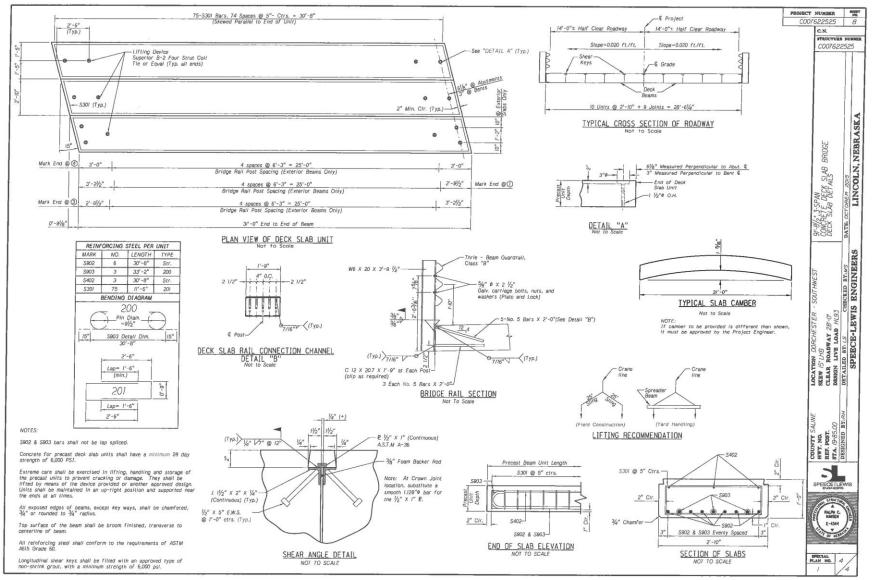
Example Details for 12-in. Thick Precast Beam-Slab Deck
